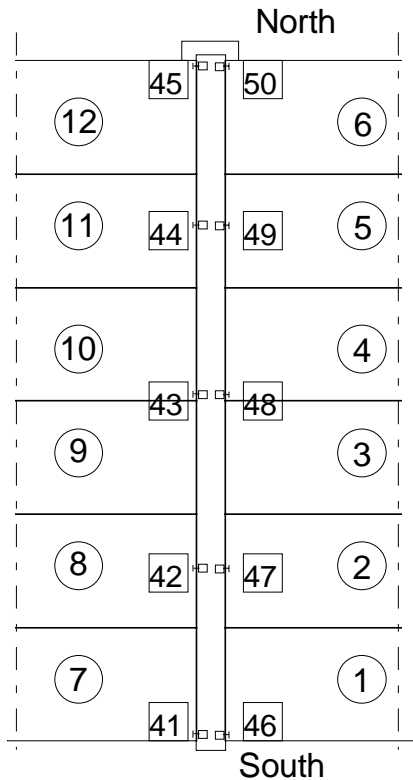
Transducers 41–50 measuring crack width on the top of the floor.
